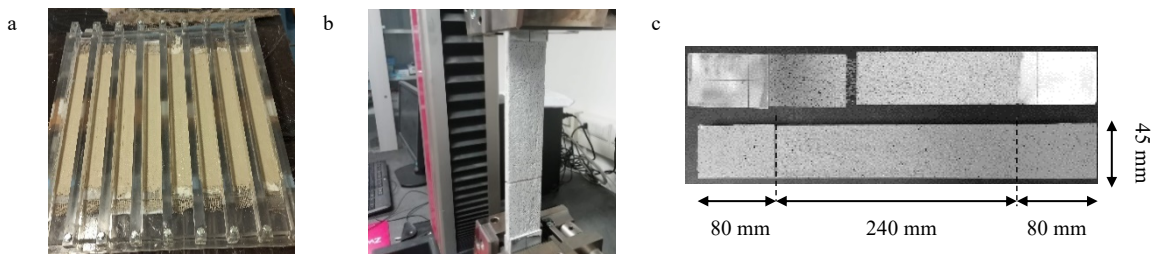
Flax-TRM coupons: (a) casting phase; (b) specimen equipped with aluminium tabs and speckle pattern within the testing machine; (c) cracked specimen compared with the uncracked sample.
